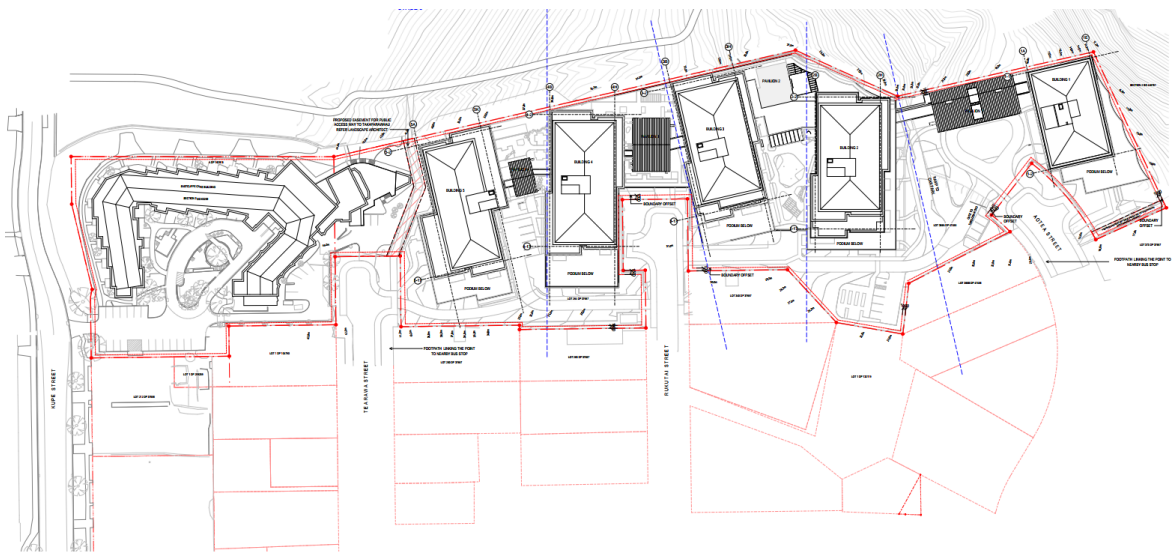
Extract of Podium Level General Arrangement Plan (Warren & Mahoney Architects, 2025)
